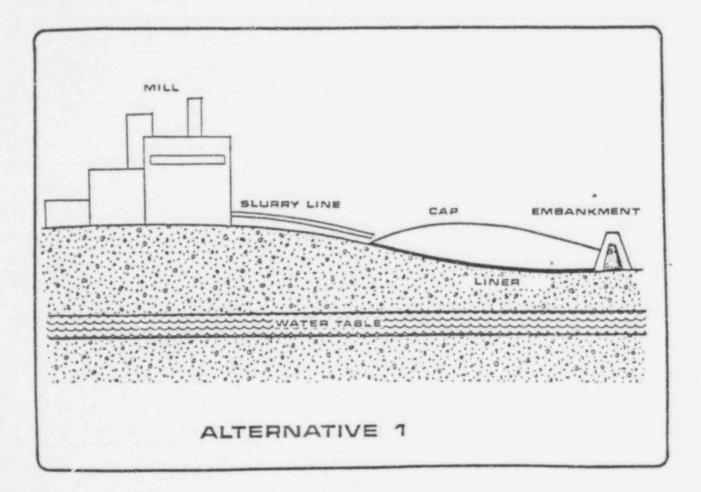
Untreated tailings deposited on prepared ground, capped, and retained by embankment(s).
